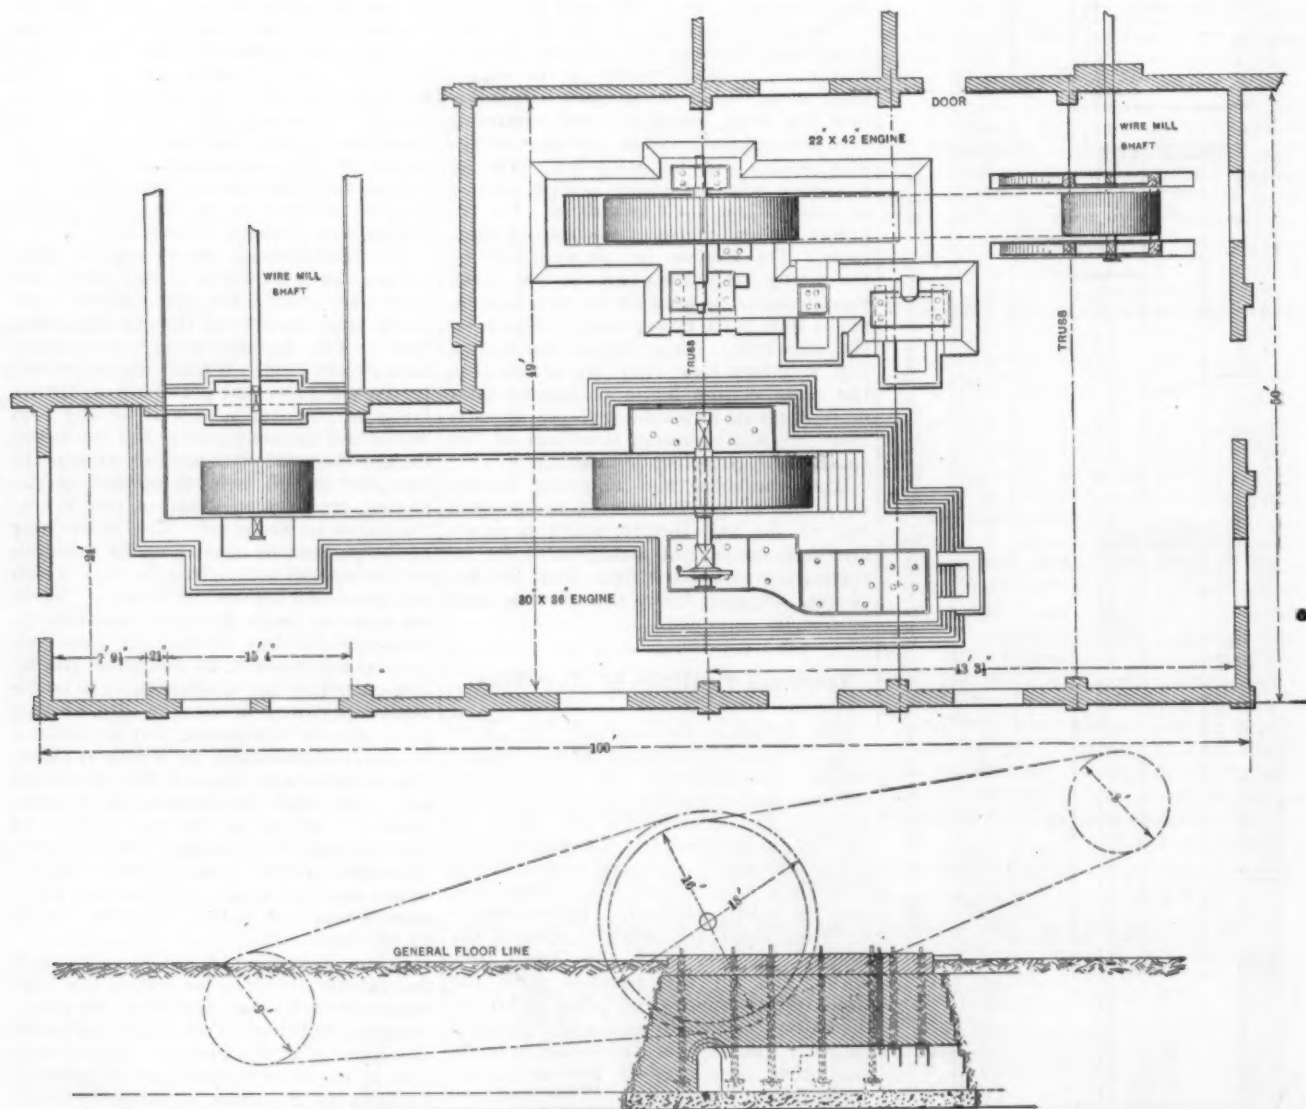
Plan of Engine and Vertical Section, Showing Belting.
